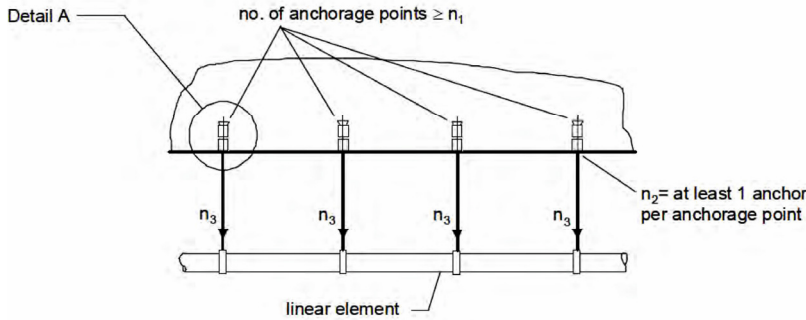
REDUNDANT FASTENING APPLICATION REQUIREMENTS FOR STRENGTH DESIGN OF TYPICAL FIXTURES
